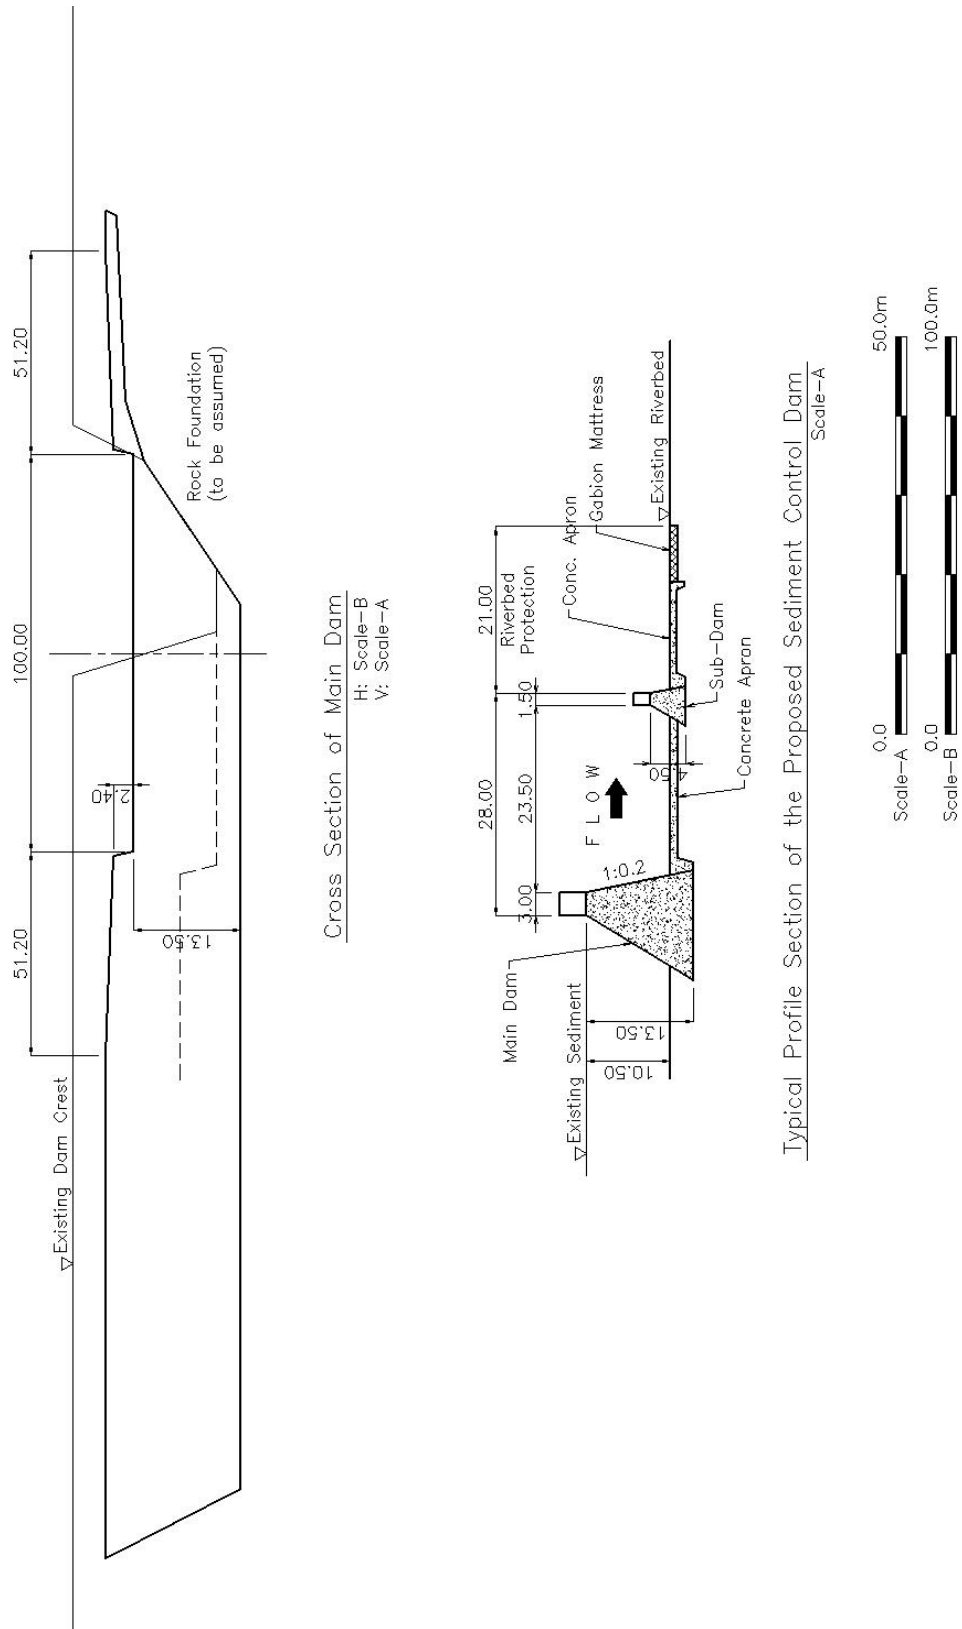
Typical Section of Proposed Sediment Control Dam
